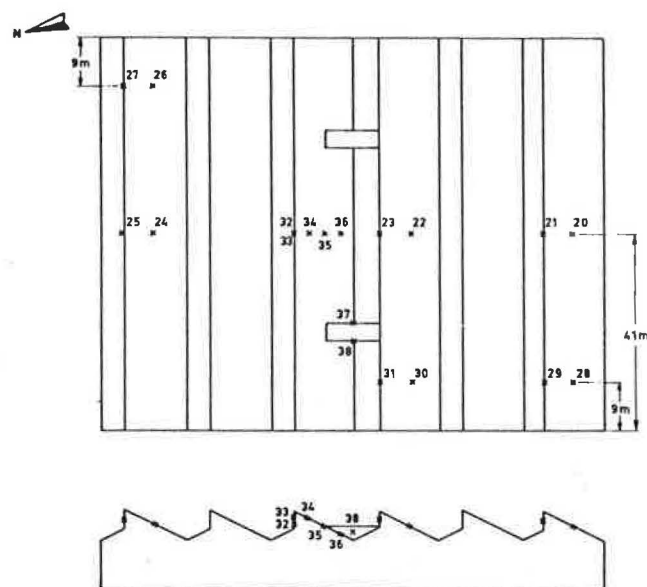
Floor plan with pressure measuring points (20 till 38) on model 1:125 of a part of an auction hall.
